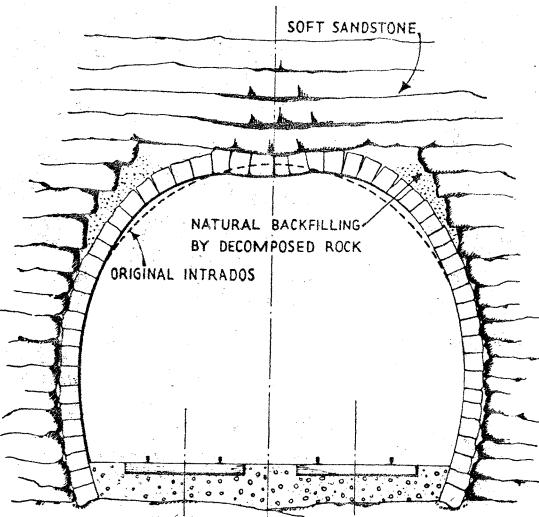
Deformation of a malconstructed tunnel arch by loosening pressure
